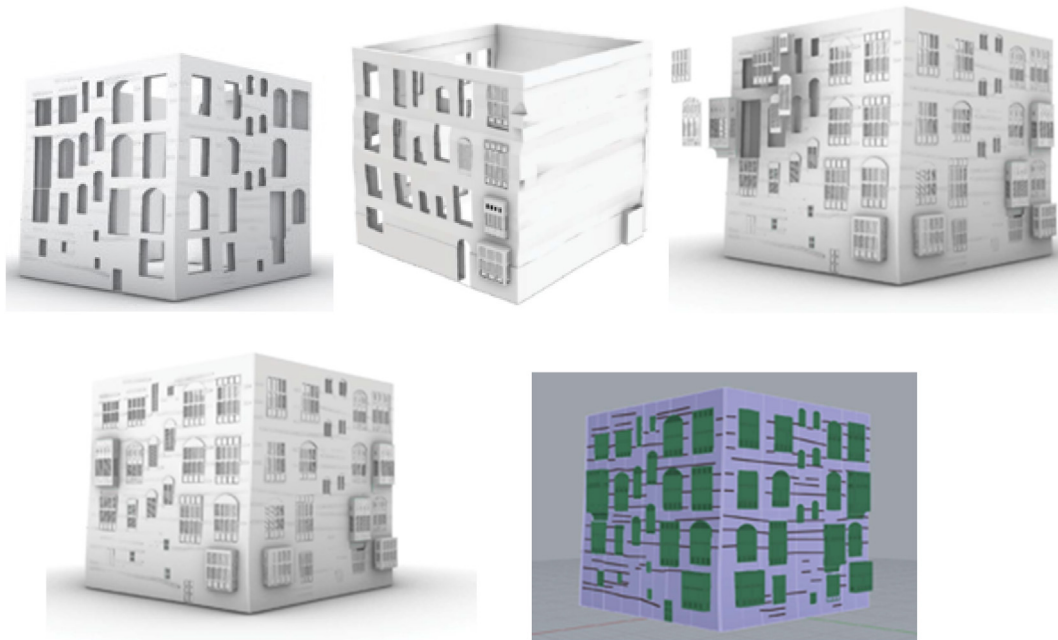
Placing the architectural elements on the Hazzazi House's facades.
